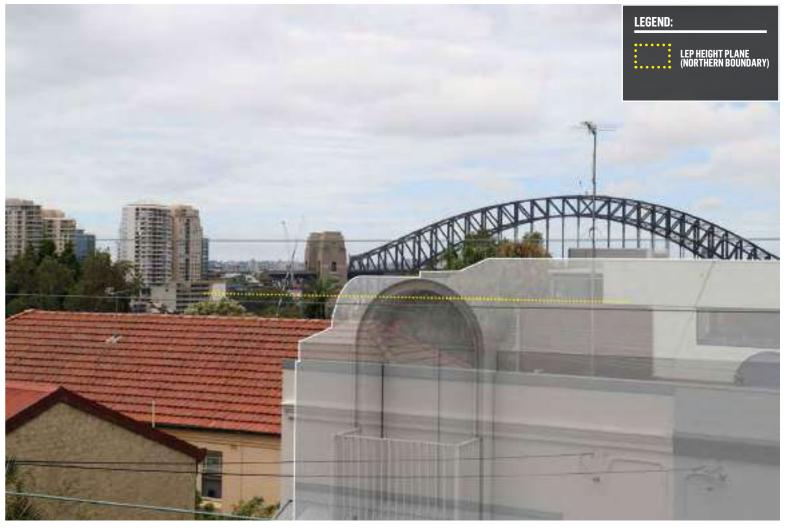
Proposed view south-east from a central standing location, master bedroom balcony, 64 Victoria Street.
